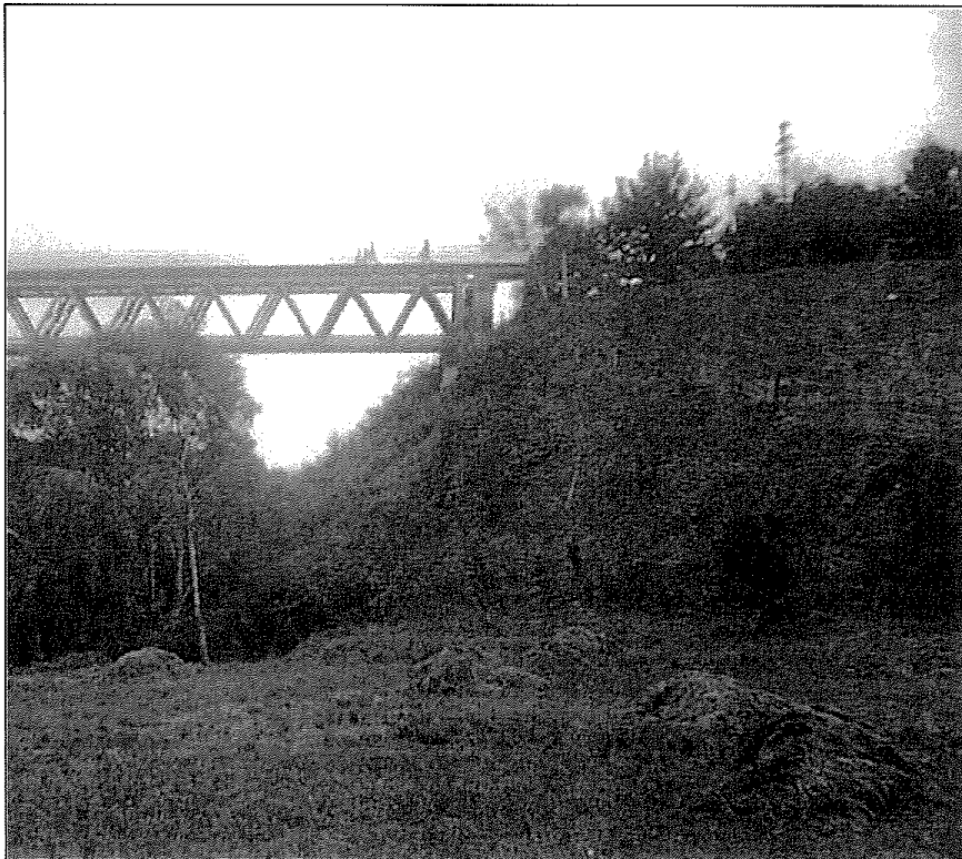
EASTERN ABUTMENT OF HAMILTON RAILWAY BRIDGE CIRCA 1920; VIEW NORTH EAST FROM JESMOND PARK (Hamilton City Library #01138) (Note: top terrace, plantings and fence posts running down the side of the slope and either grass cutting or earth mounding in Jesmond Park).
